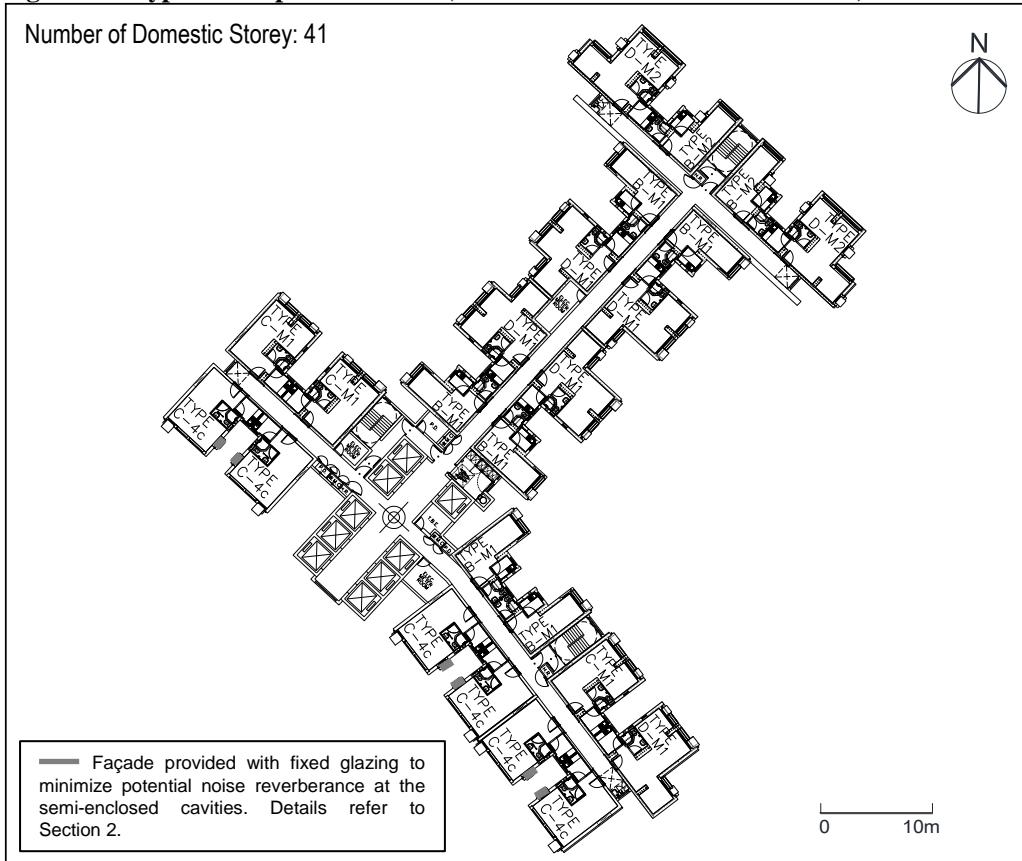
Typical floor plan of Block A (Scheme received on 3 November 2023)
